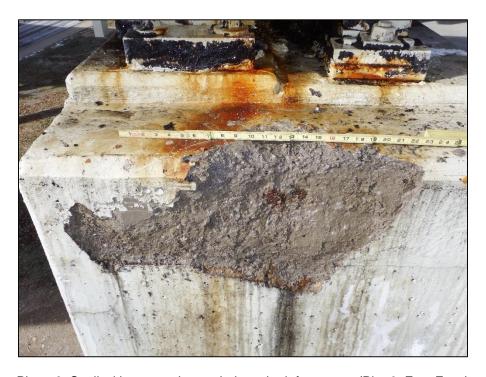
Spall with exposed corroded steel reinforcement (Pier 6, East Face)
